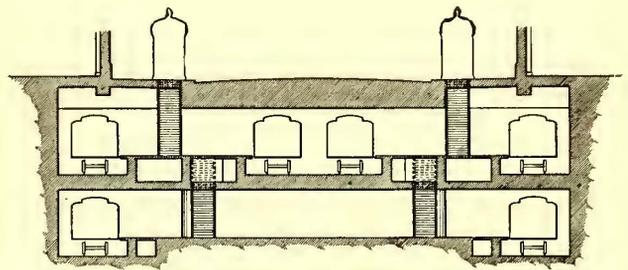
ONE PROPOSED ARRANGEMENT OF DOUBLE-DECKED STATION
